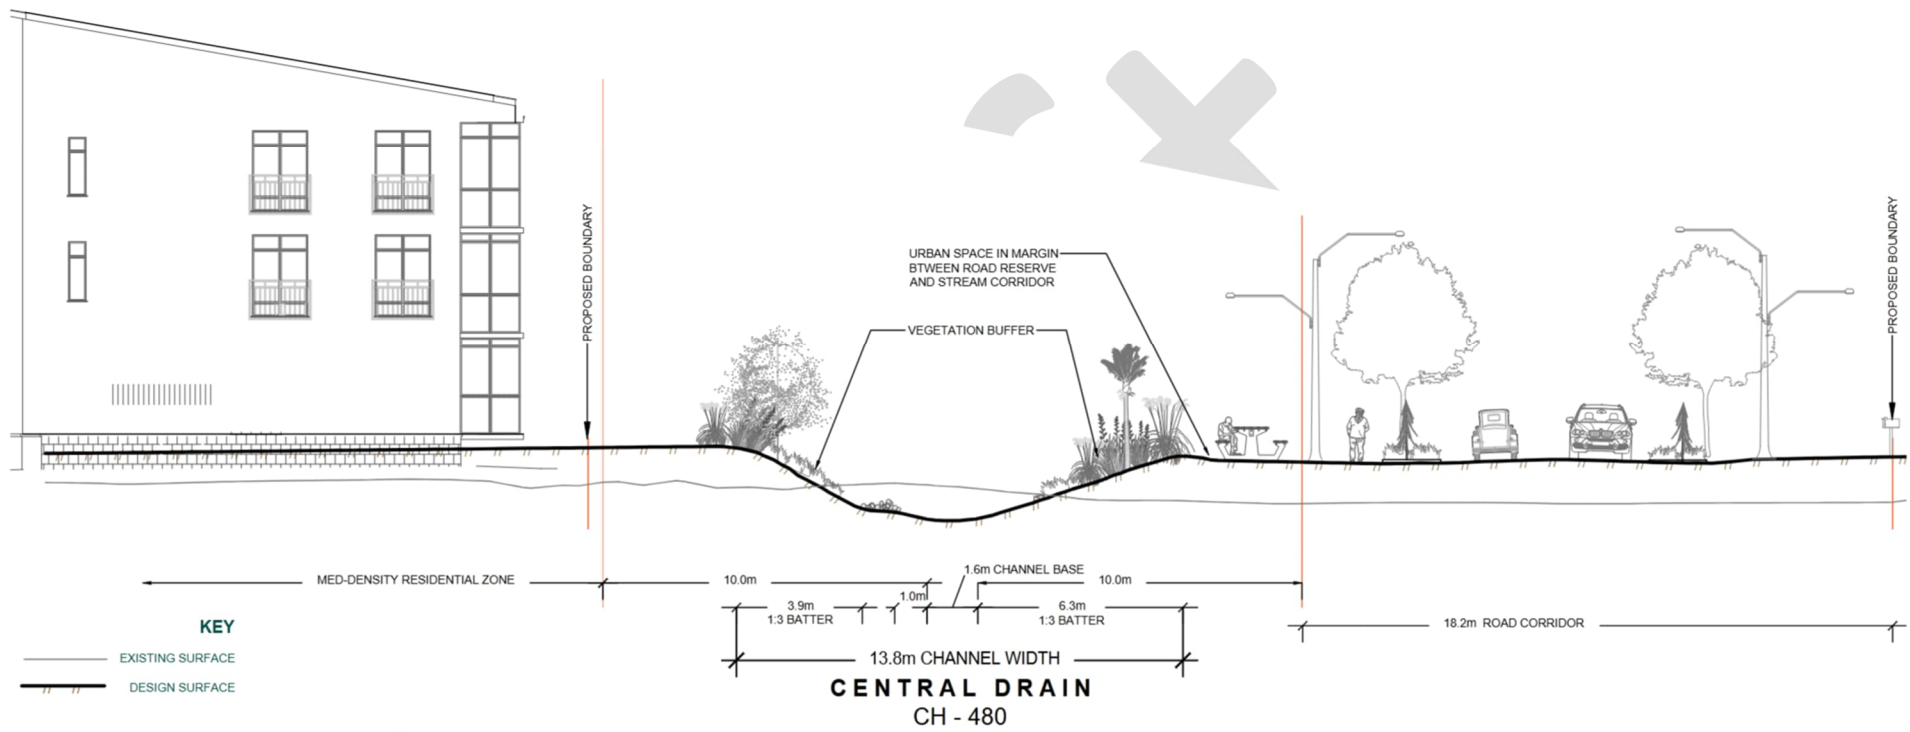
Design cross section of recontoured central drain at CH 480 (metre distance from eastern site boundary). Existing ground (light grey) compared against design surface (bold black line). (Provided by Landlink).
